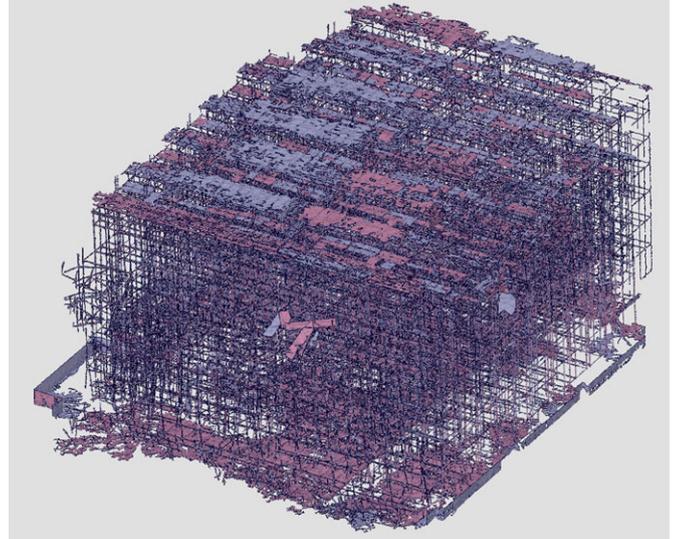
The Whole 3D scan image of the reconstructed shoring system. The reconstructed 3D shoring system was examined by making cross-section and floor plan drawings.
